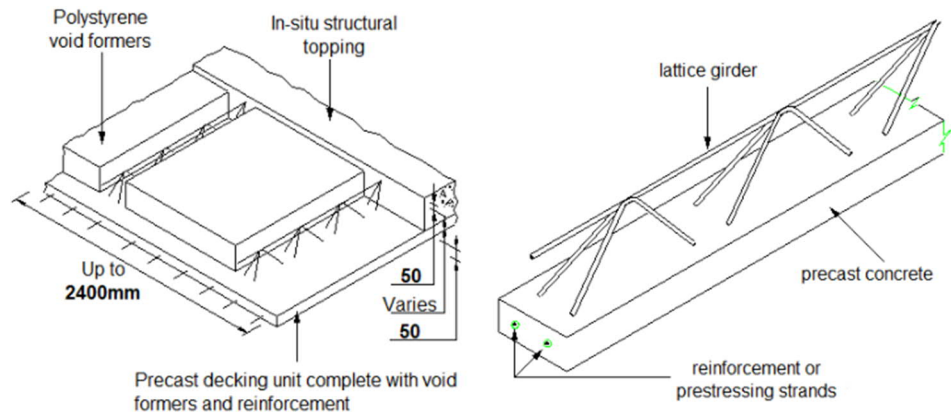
Filigree slab (left); lattice girder (right); (The Concrete Centre, 2017)
